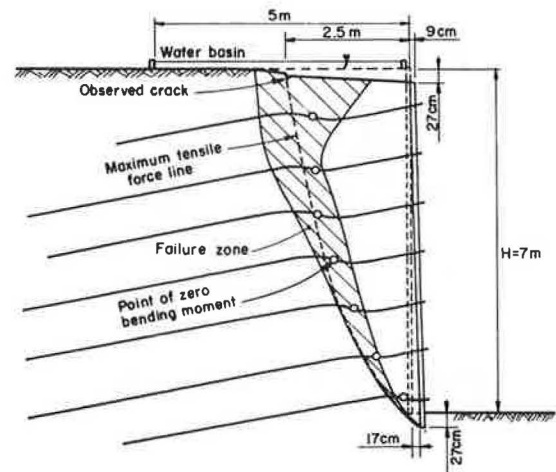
Failure zone developed in full-scale experiment on nailed soil wall.
